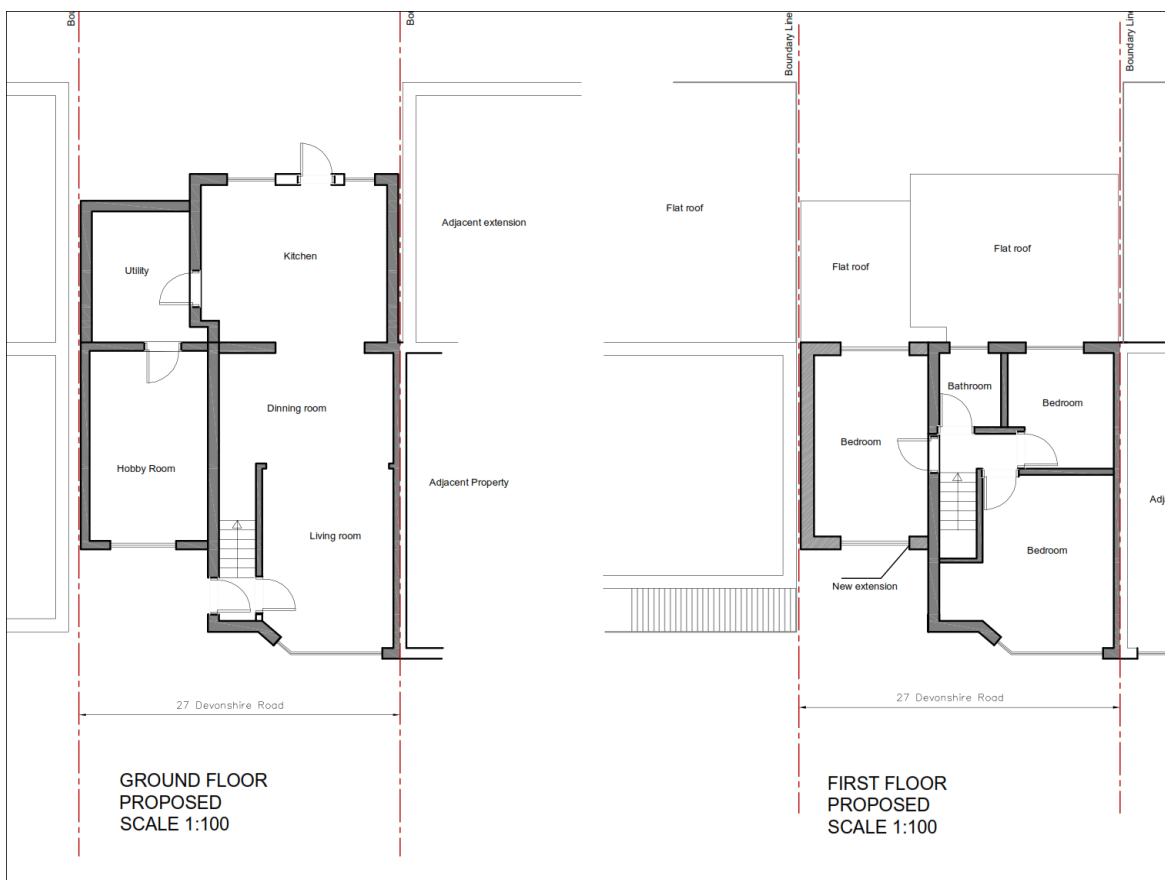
EXISTING BUILDING & PROPOSED EXTENSION
